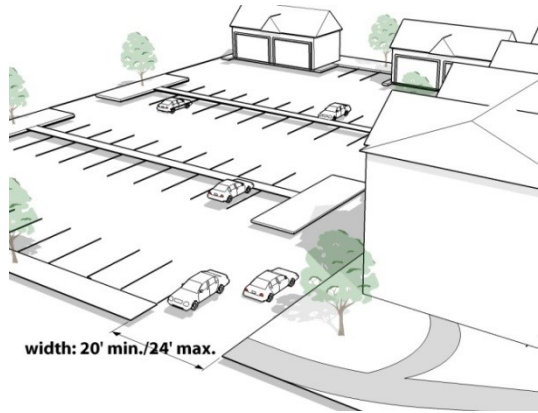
A: Example Width of Driveway For Other Residential Uses
